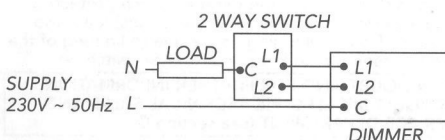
Two Way Switching (only 1 Dimmer can be used)
